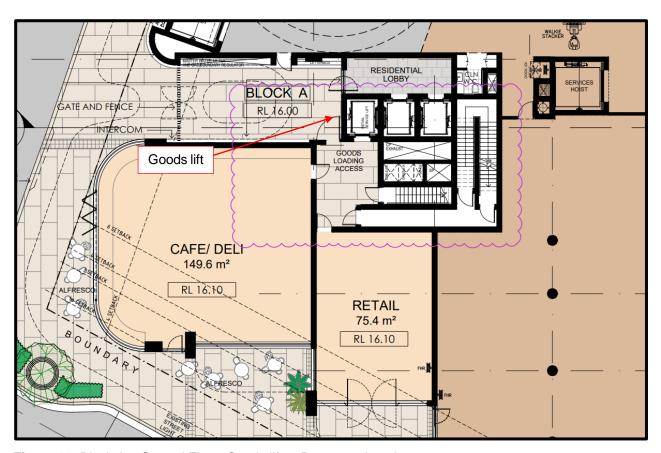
Block A - Ground Floor: Goods lift to Basement Level 1
